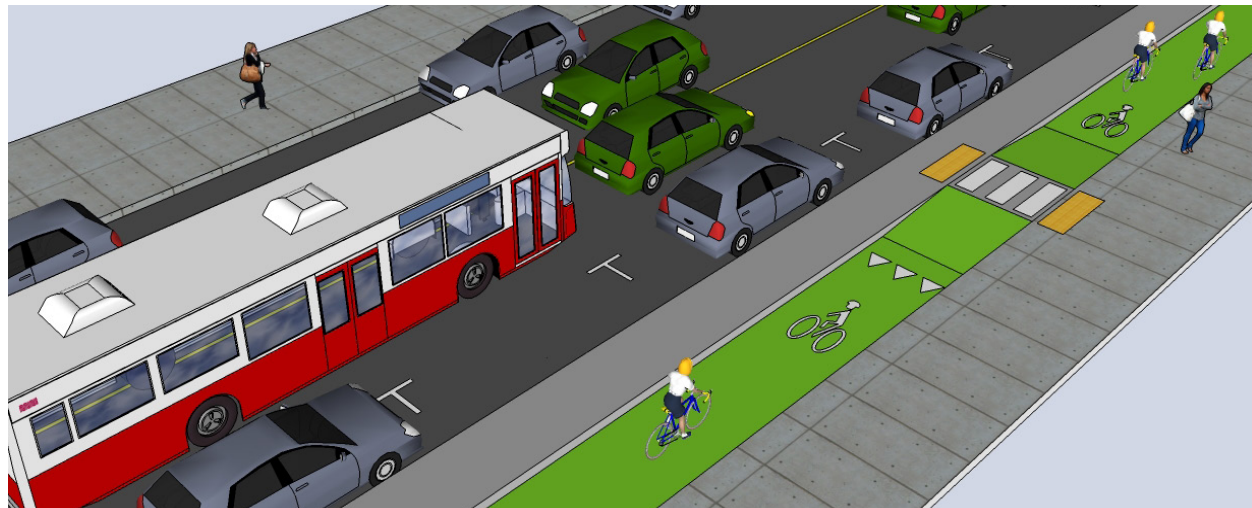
Potential pavement markings to alert pedestrians and cyclists to each other's presence.
